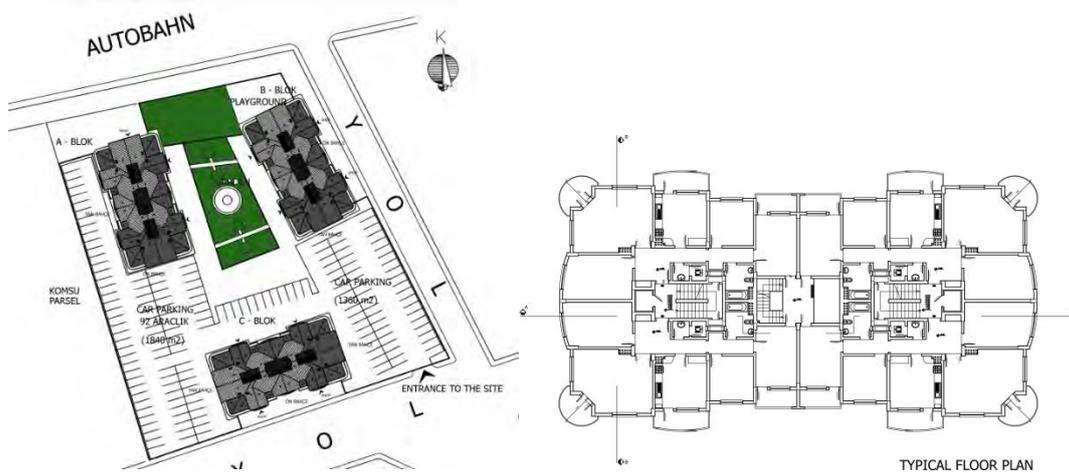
Site plan and typical floor plan of Mavisehir Housing
